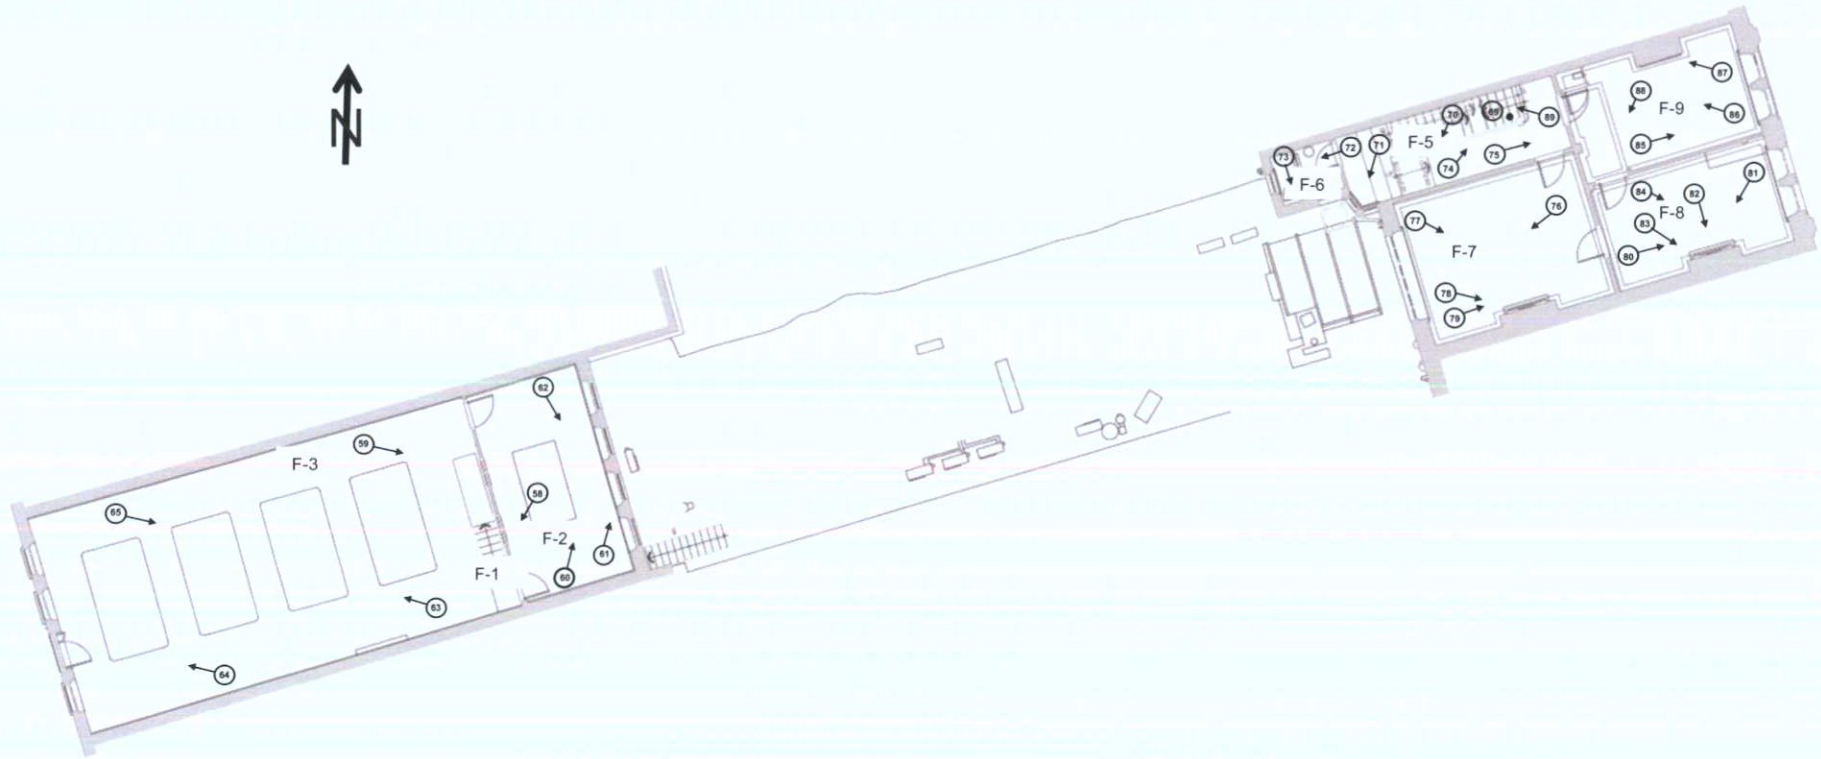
Plan at first floor level (note: F-4 is the ground-floor entrance to the first floor – see figure 6 above)
